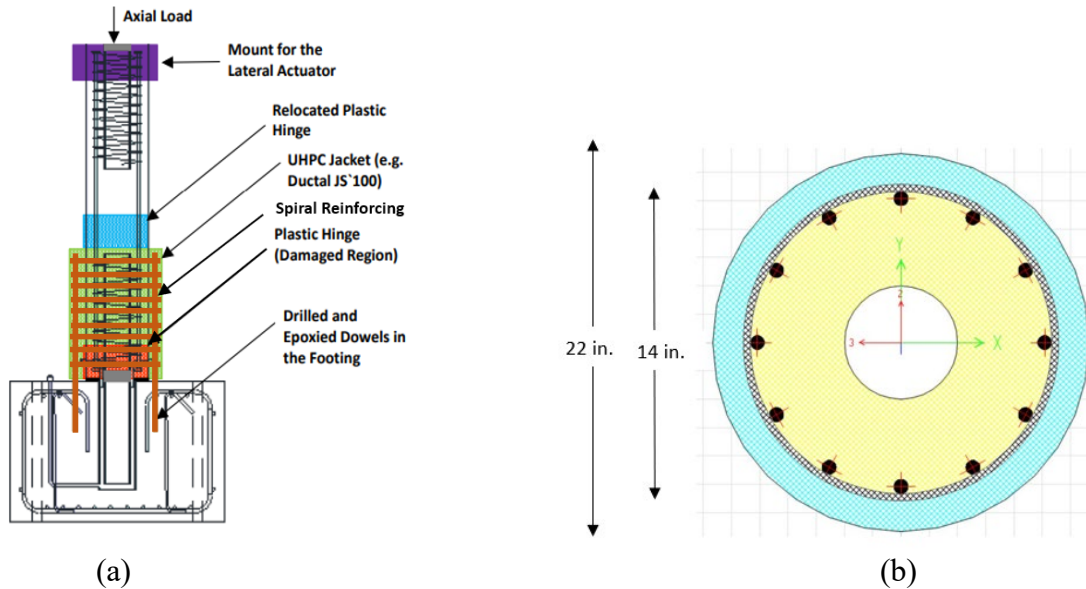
Overall Concept for Retrofit: (a) Concept for UHPC Jacket (Green); (b) Cross-section of Precast 1 Retrofit (1 in. = 2.54 cm)
